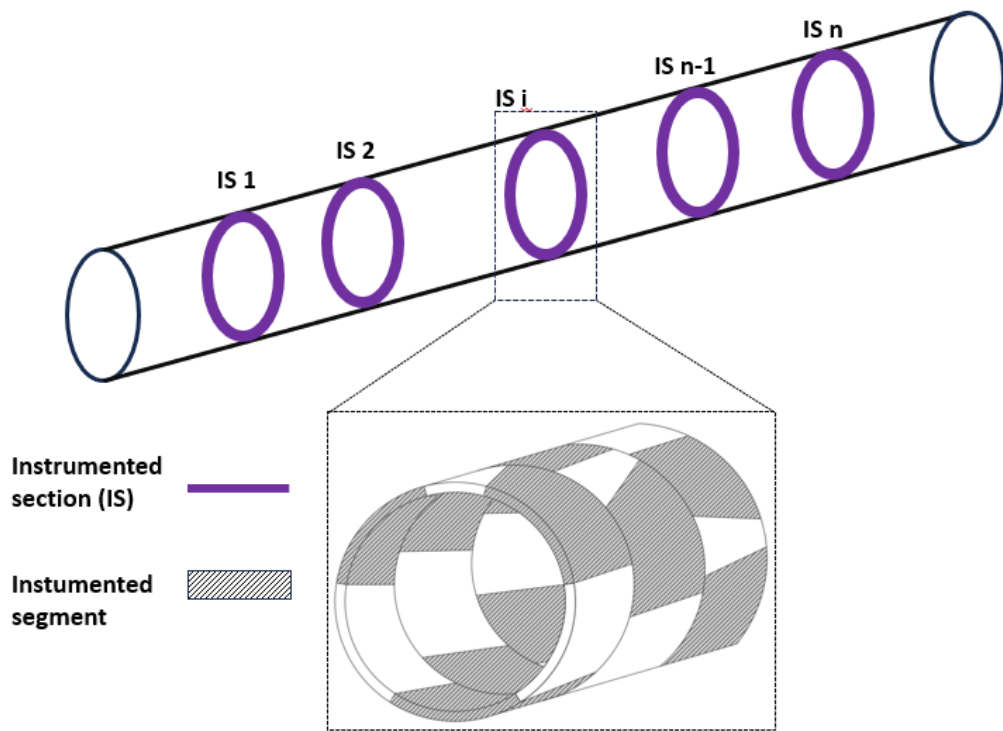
Typical instrumented tunnel section. In this case the instrumented section has three instrumented rings.
